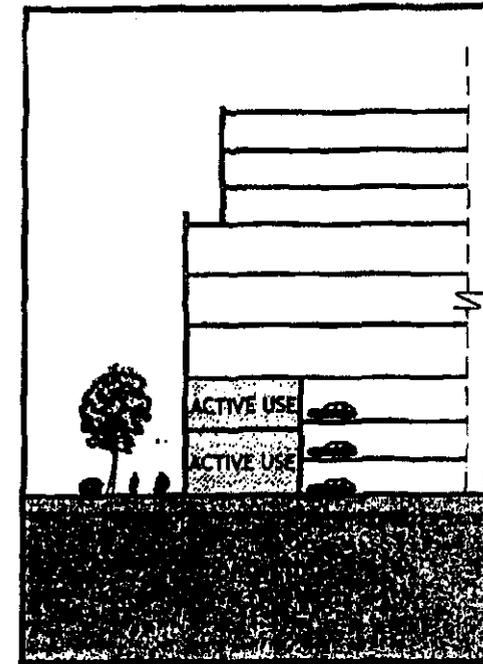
Section showing active use on street frontage; parking garage is not visible from the street
